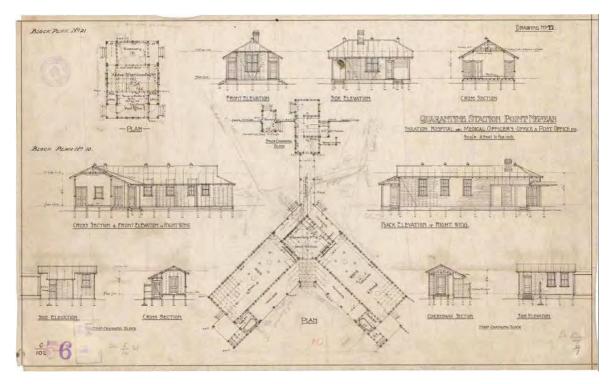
Isolation Hospital and Medical Officer's Office & Post Office etc. Measured Drawing. Block Plan No. 21. Drawing No. 22. The subject building is in the centre of the plan.
